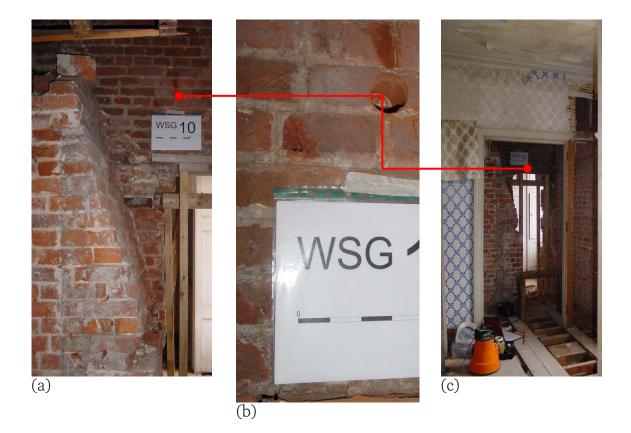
(a) north-facing interior wall on bedchamber floor adjacent to chimney stack in the Southampton Room, showing location of WSG-10, (b) close-up of sampling location WSG-10, (c) general view of location of WSG-10 in relation to west-facing exterior wall
